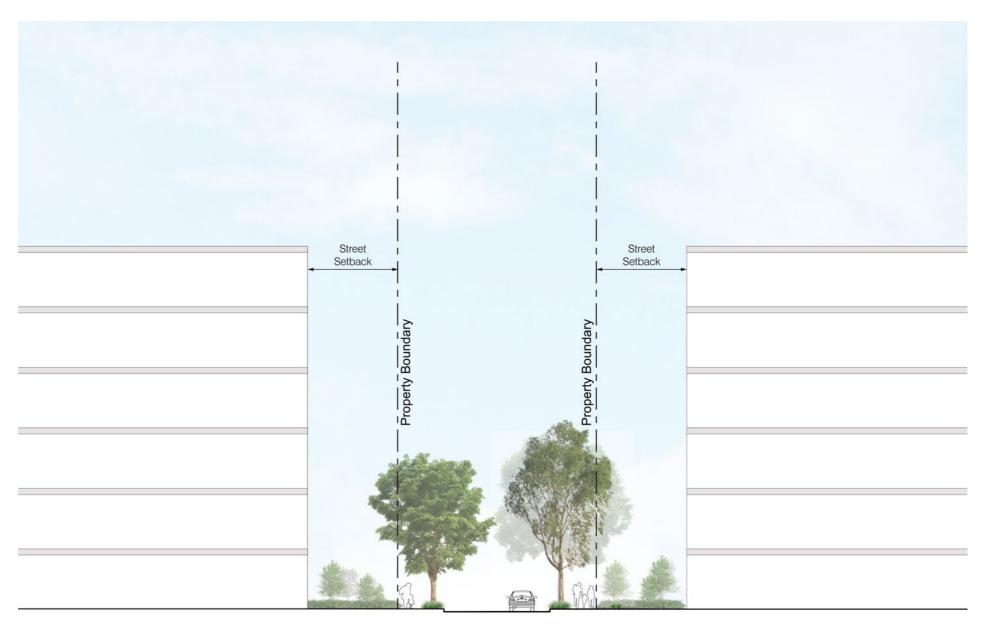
Proposed section - Enterprise Neighbourhoods
